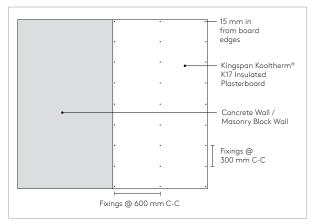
Kingspan Kooltherm® K17 Insulated Plasterboard Installation Details for mechanical fixing.
